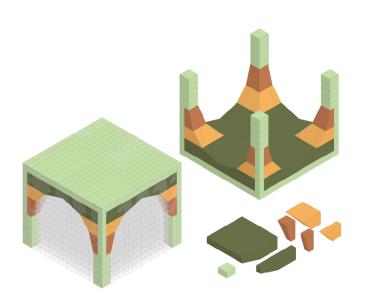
, Vault with openings from top and bottom view, predefined building blocks for the vault creation and for different slopes
